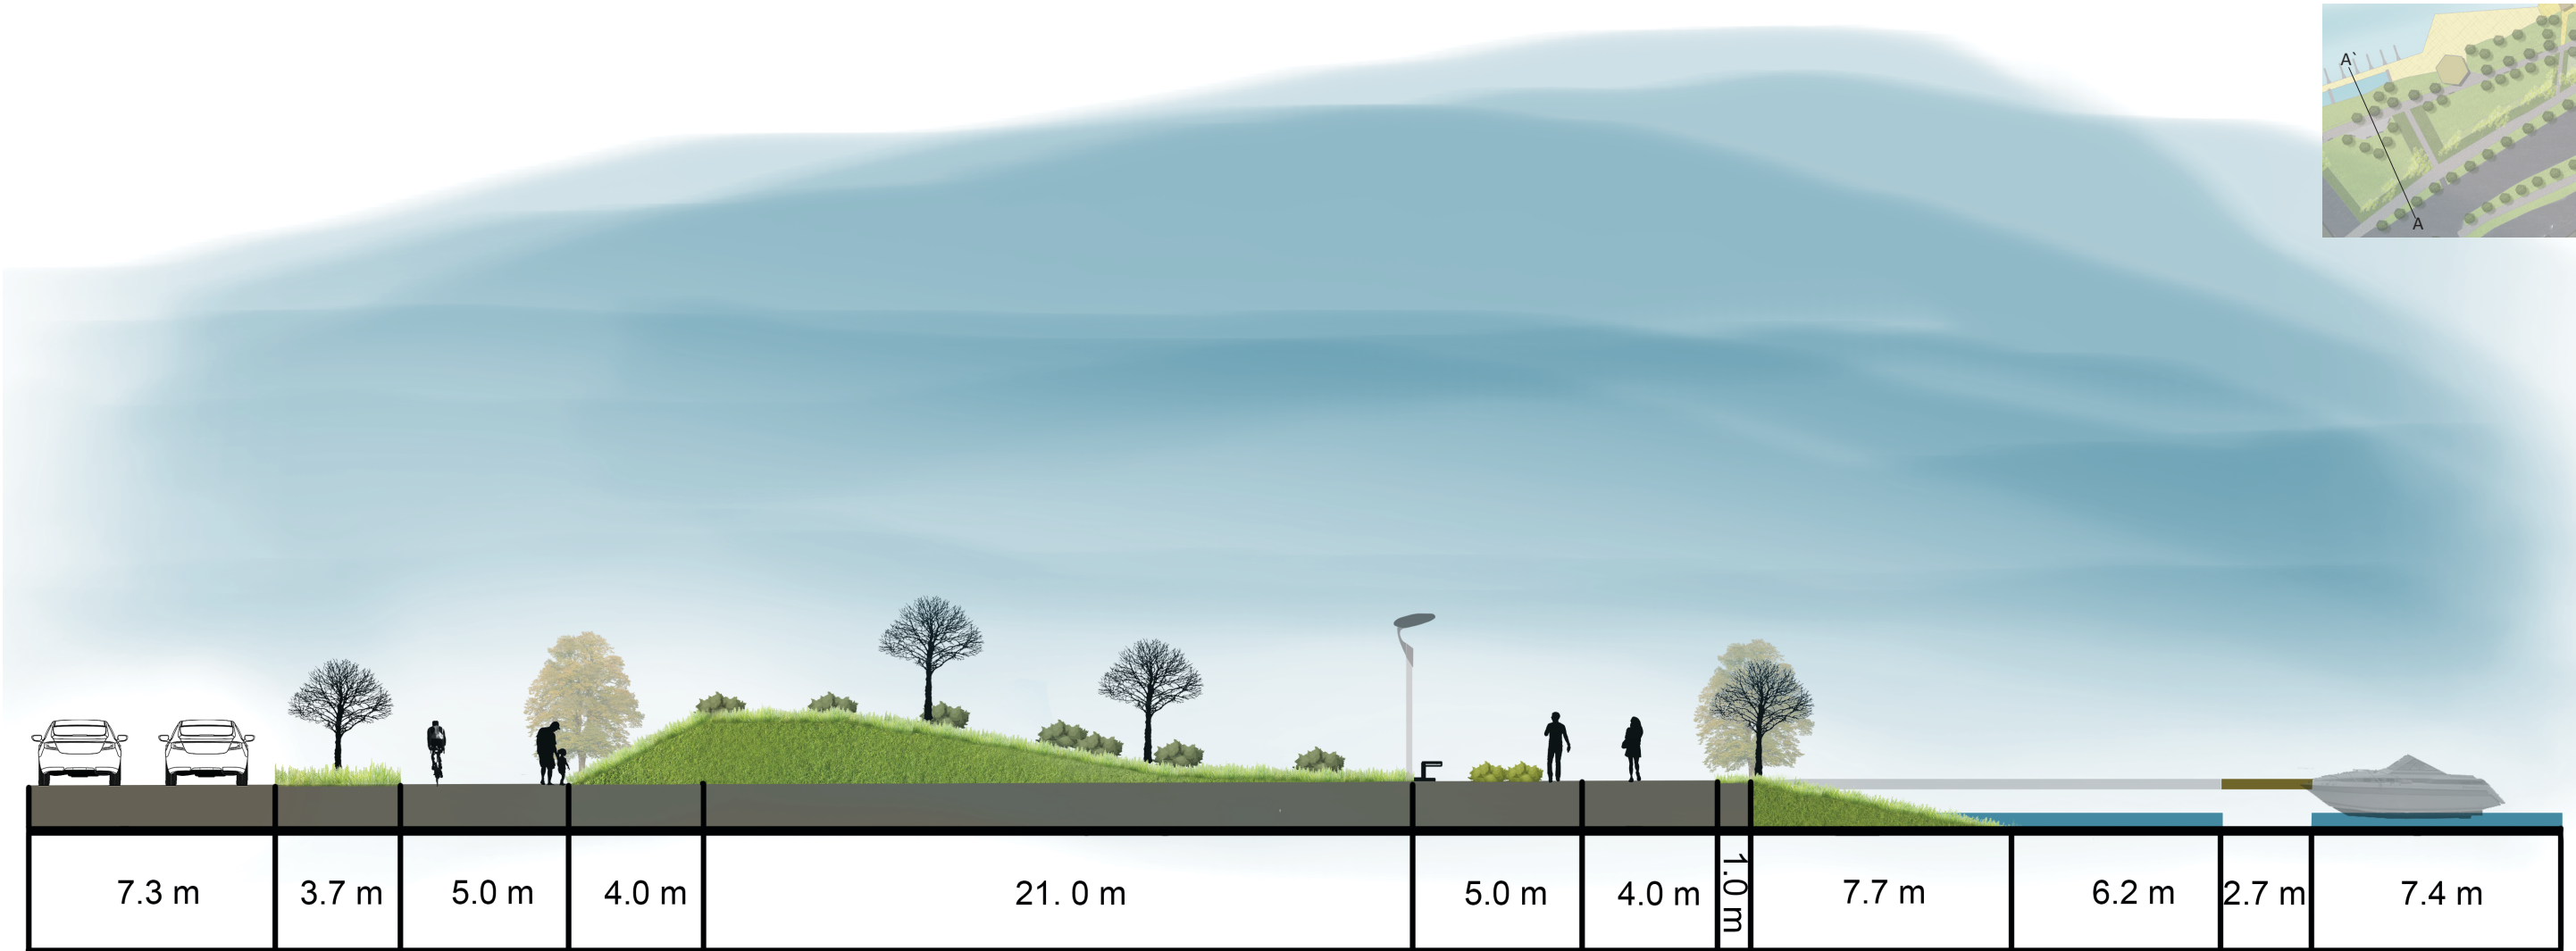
Section between Turu street and the new boat harbor. (Section 1:200)
